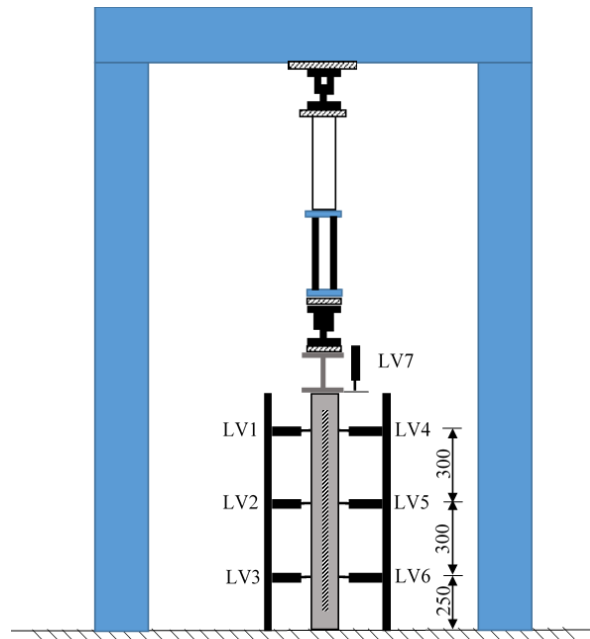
Instrumentation - Positioning of LVDTs - side elevation (all dimensions are in mm)
